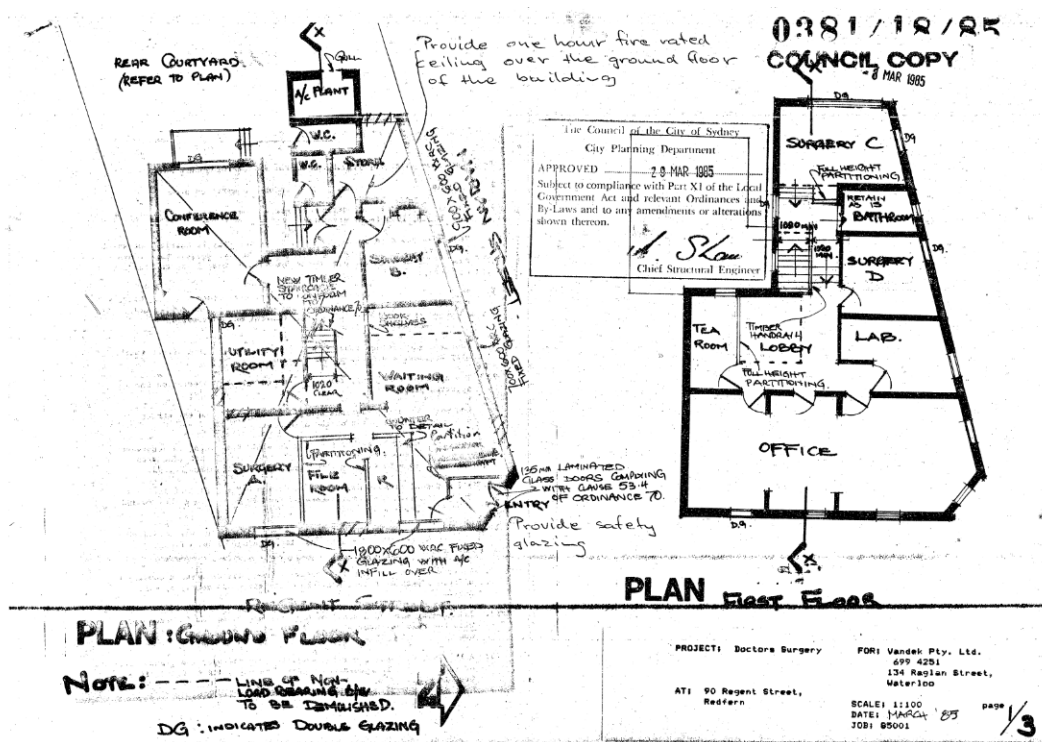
Plans depicting the proposed renovations to the building in 1985.⁵⁹
